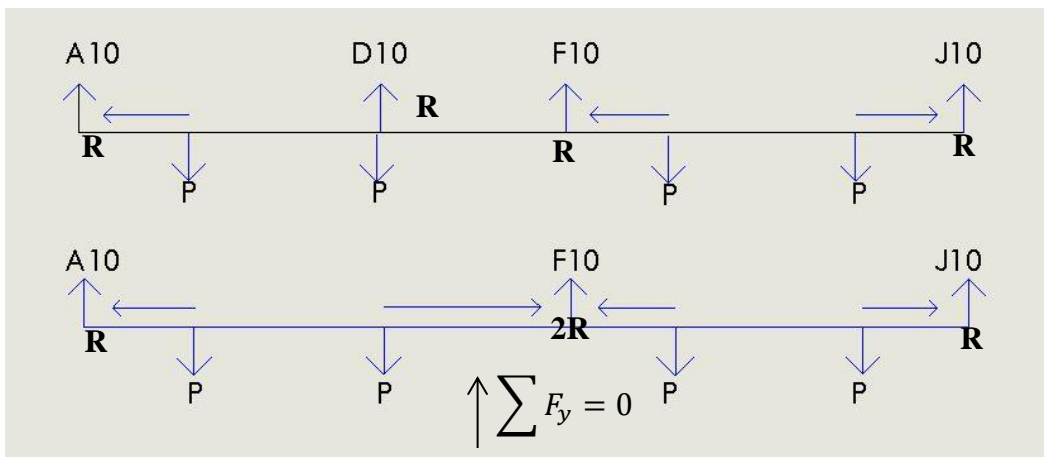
External wall top plate load paths along the wall spanning from A10 to J10 with and without the connection at
